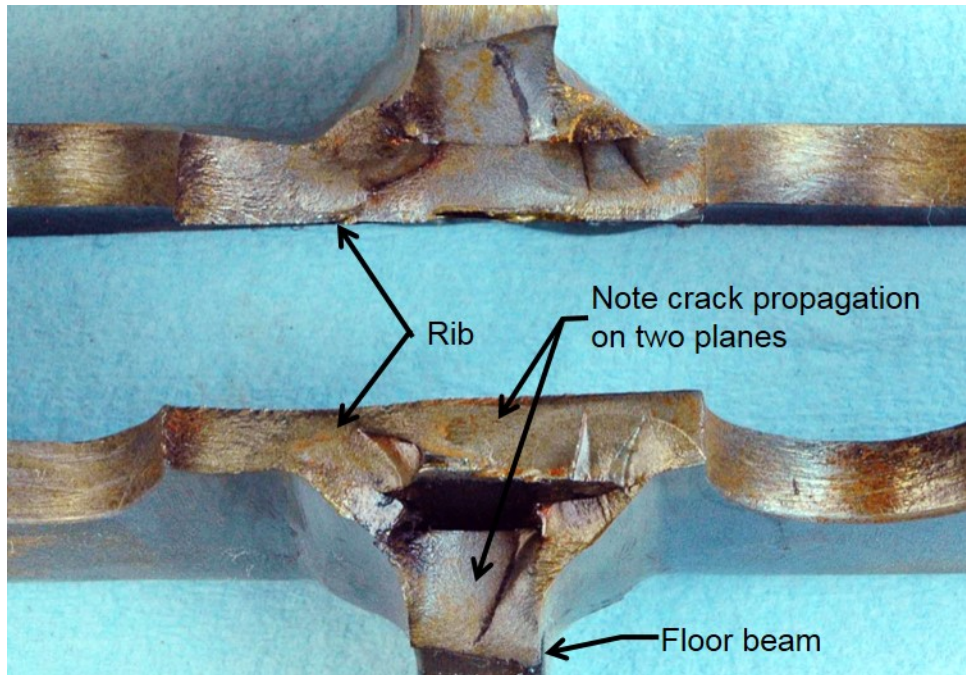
Mating fatigue fracture surfaces for the crack to the north of rib in MU1
